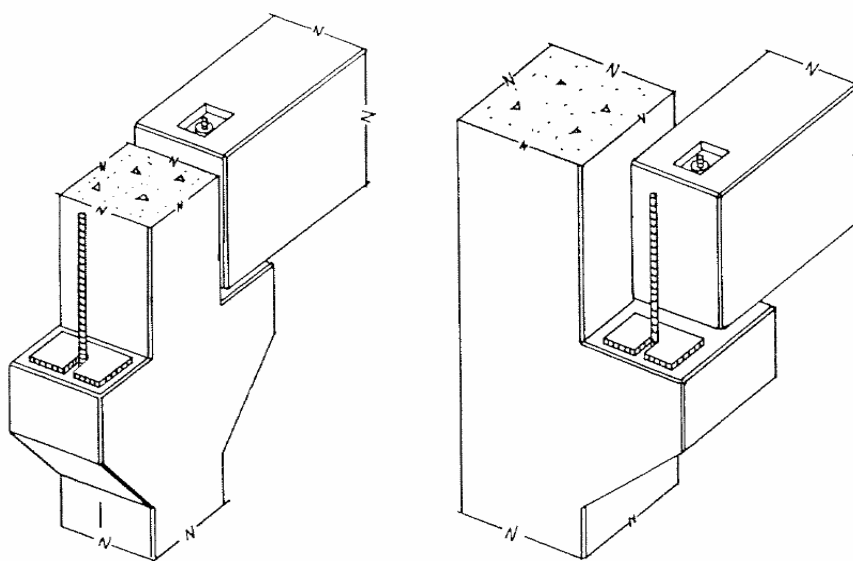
Examples of beams connected to columns, from *Betongindustriens Landsforening* (1996).
